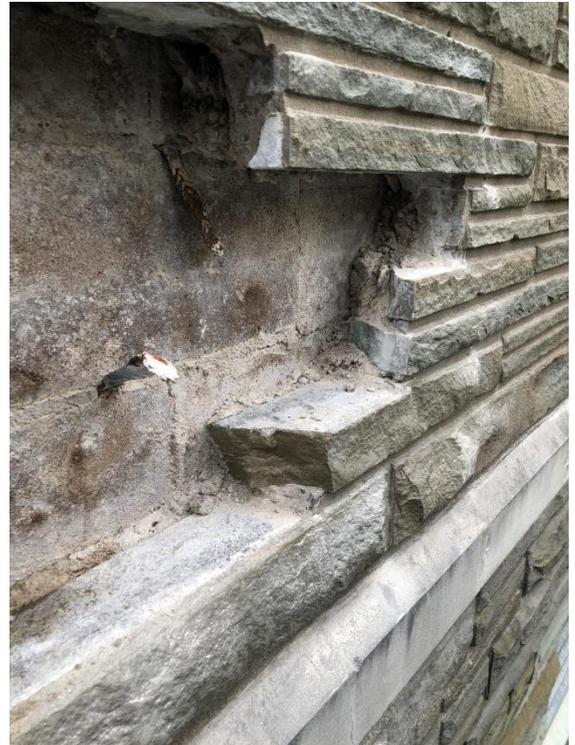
Opening 7 – Mortar filled cavity and corroded strip ties.
